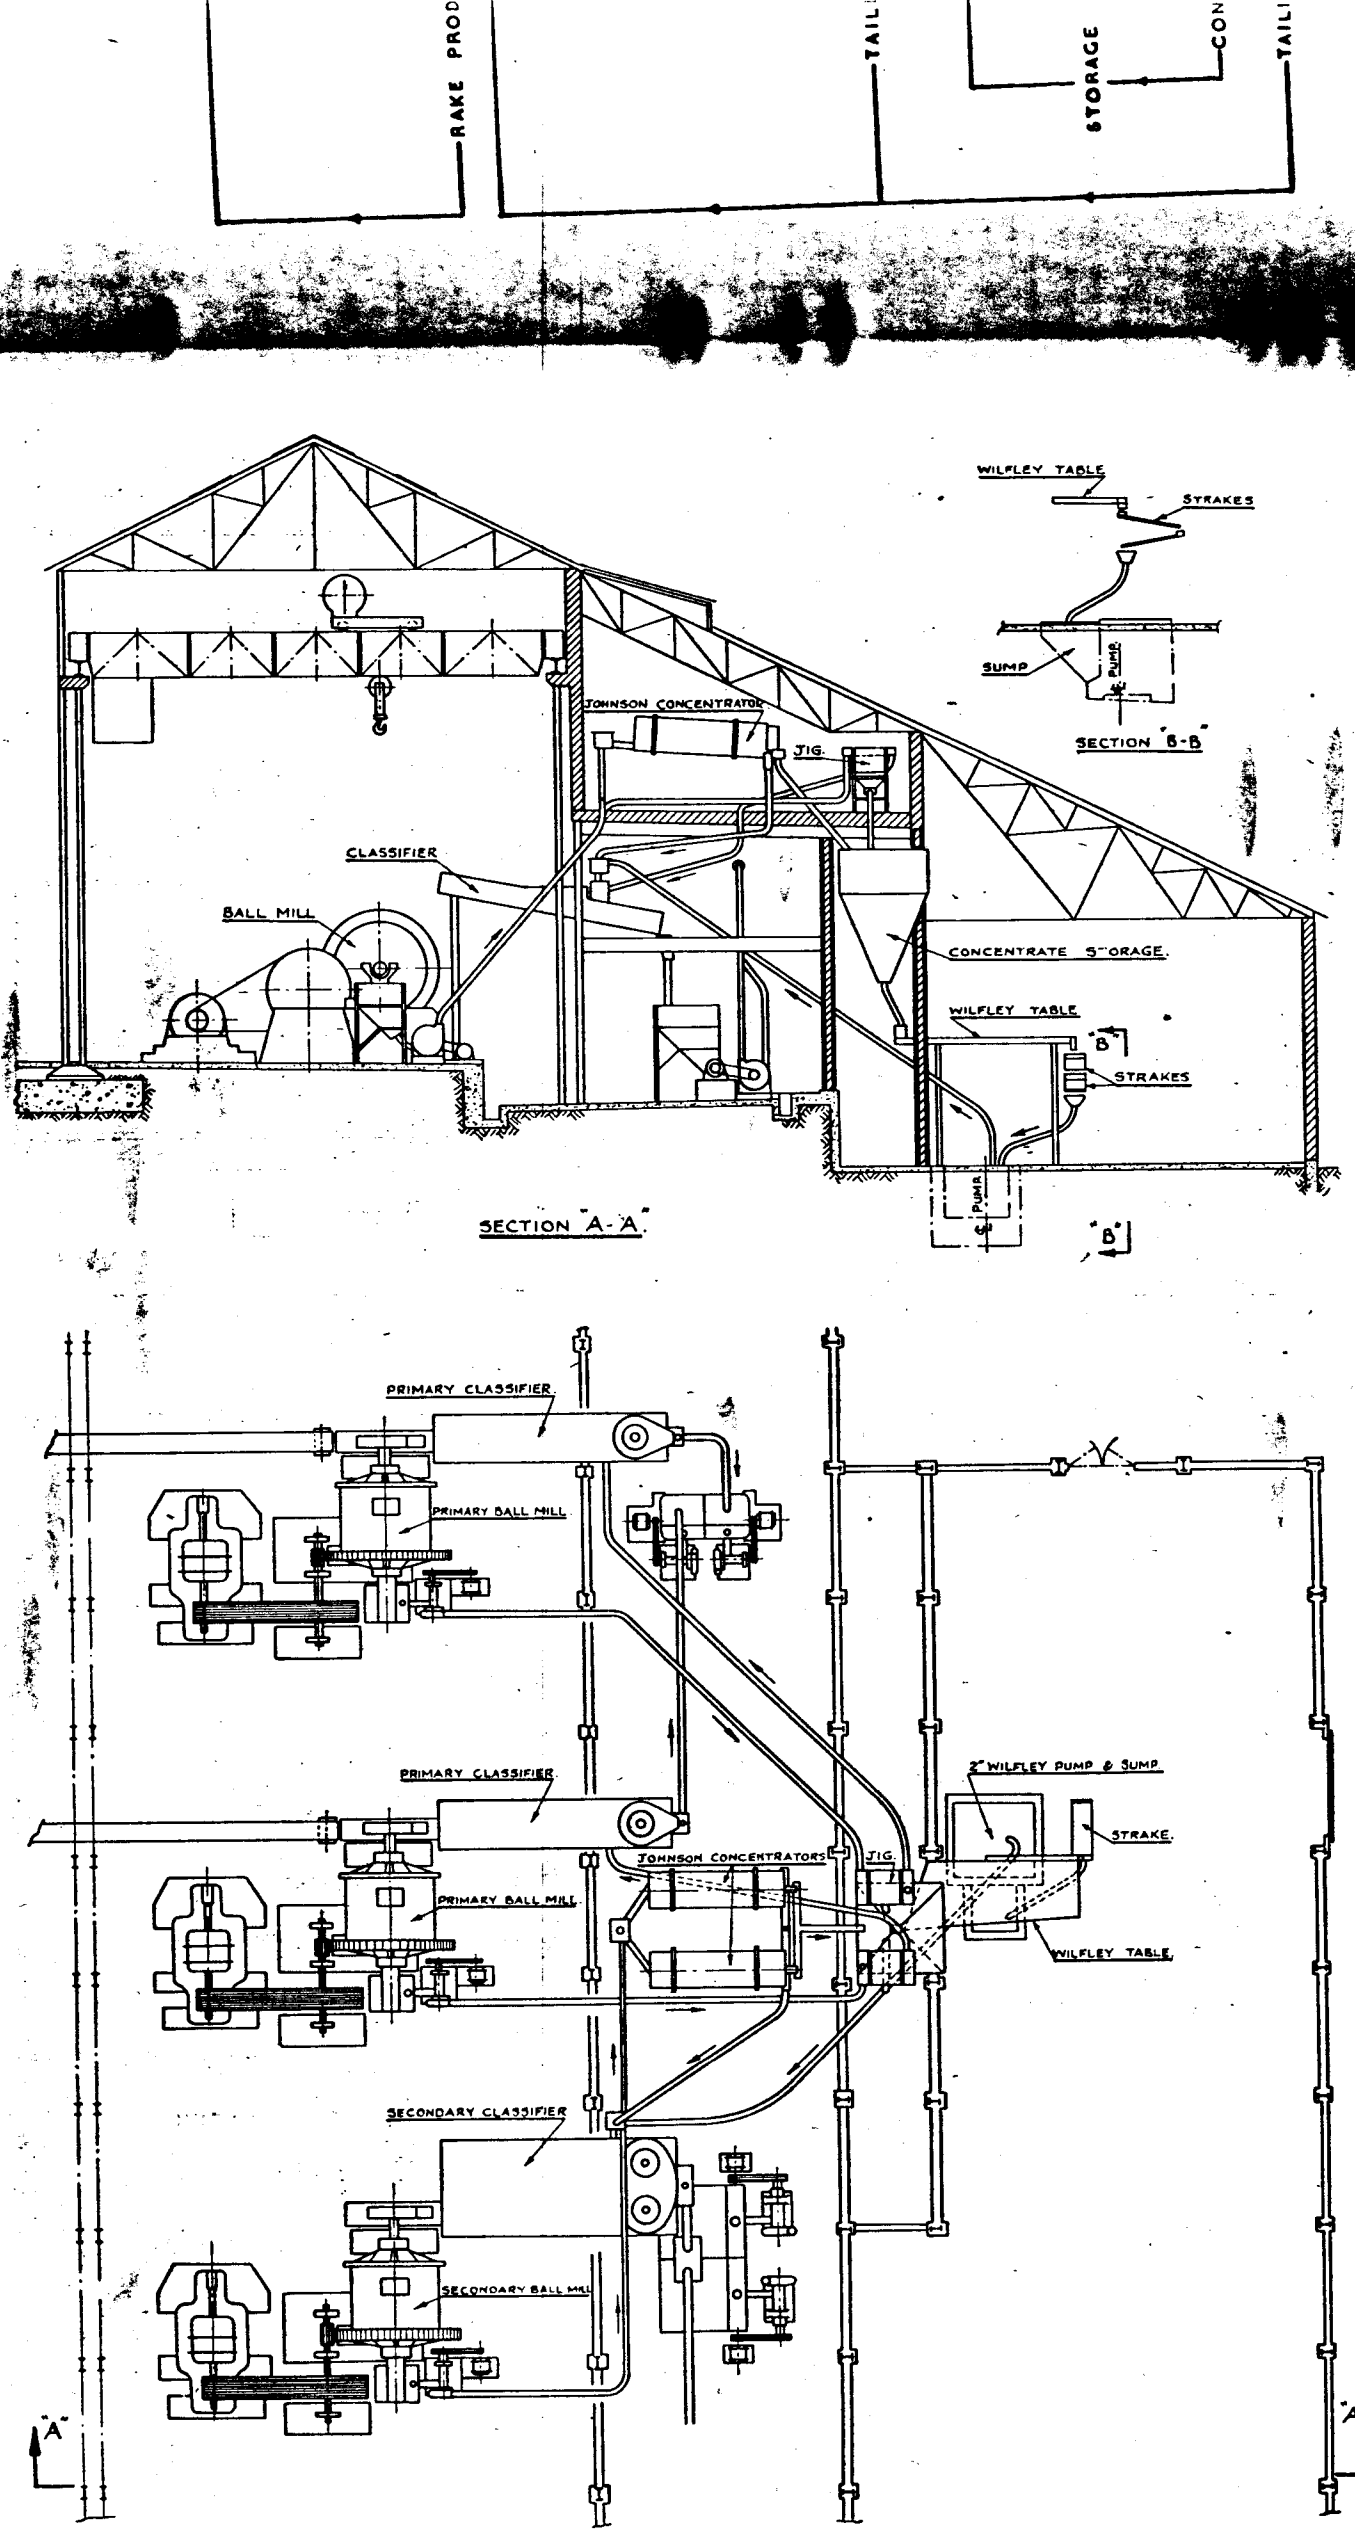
NEW MILLING AND CONCENTRATOR INSTALLATION—PLAN AND SECTION
